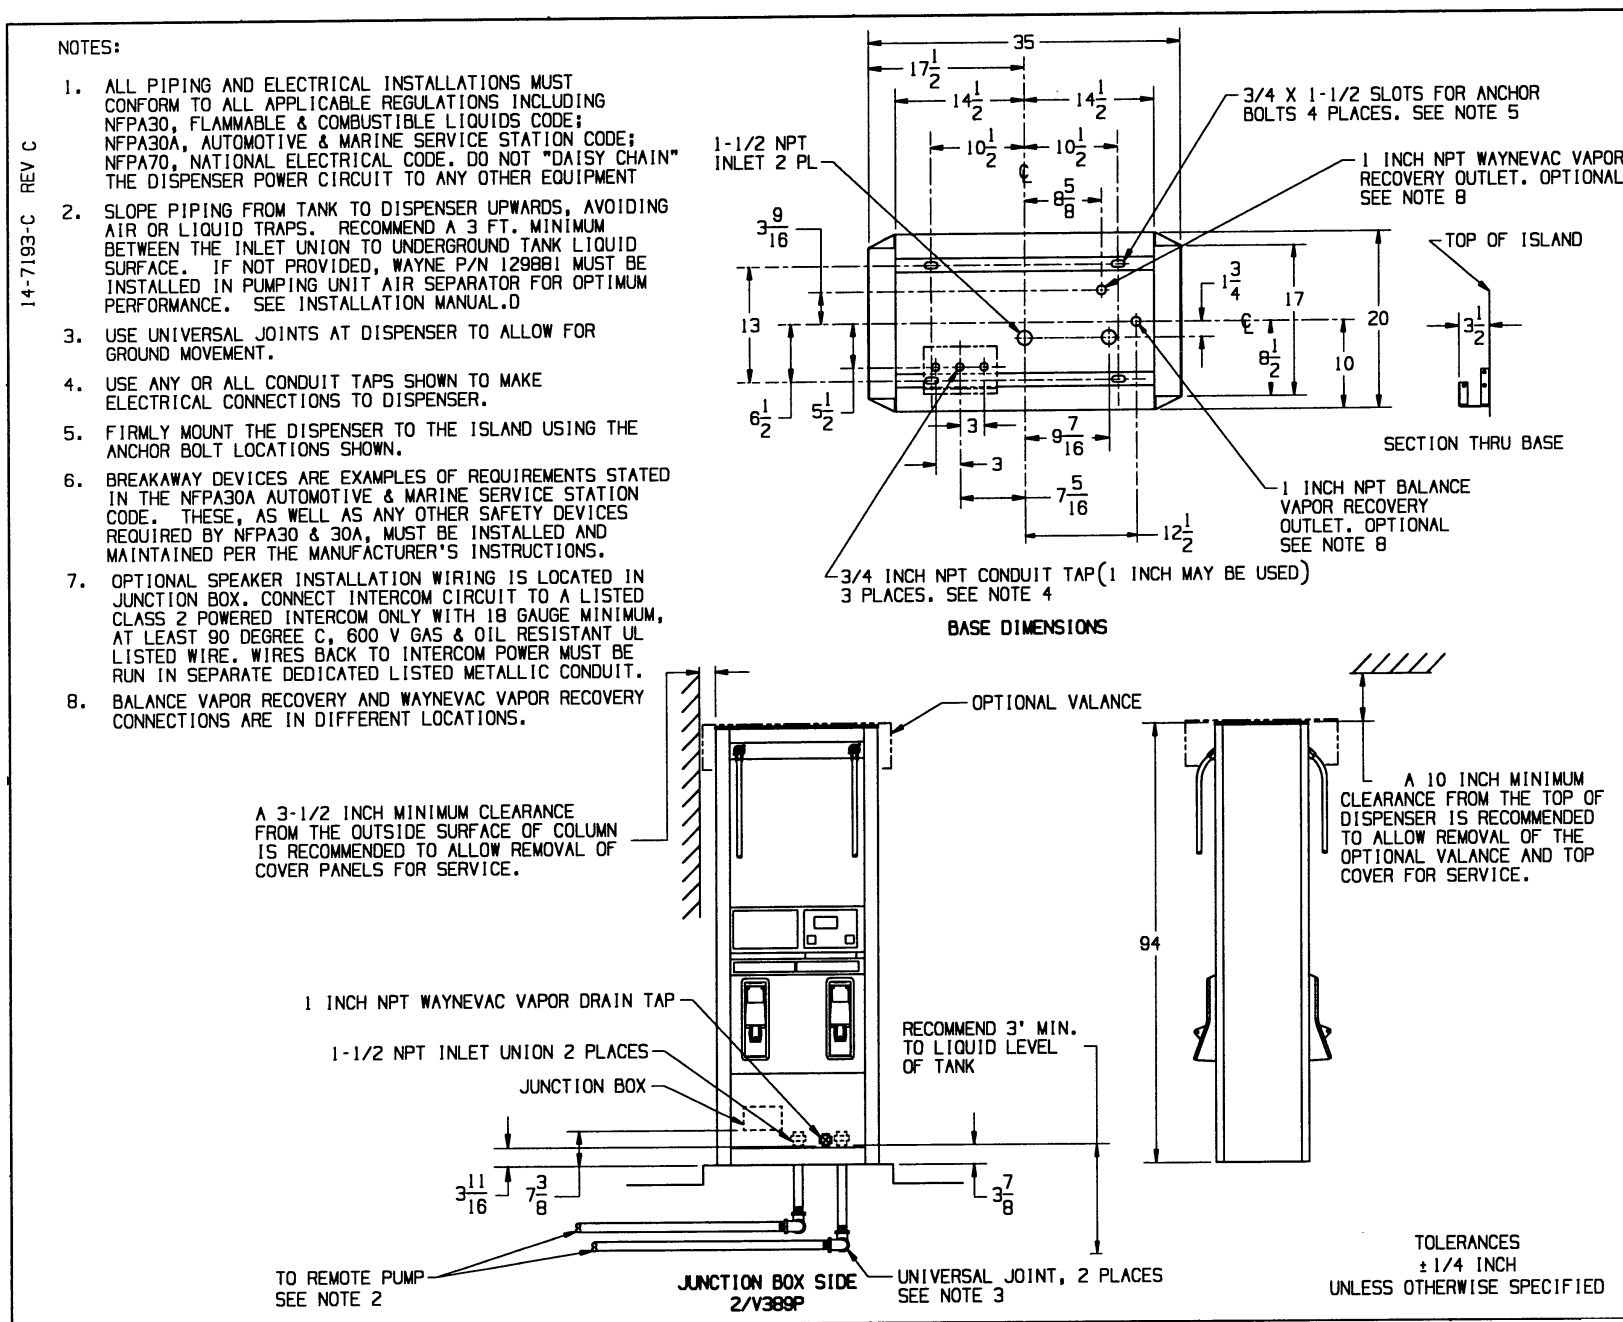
14-7193-C Installation Instructions - 3/V389P (Suction)
